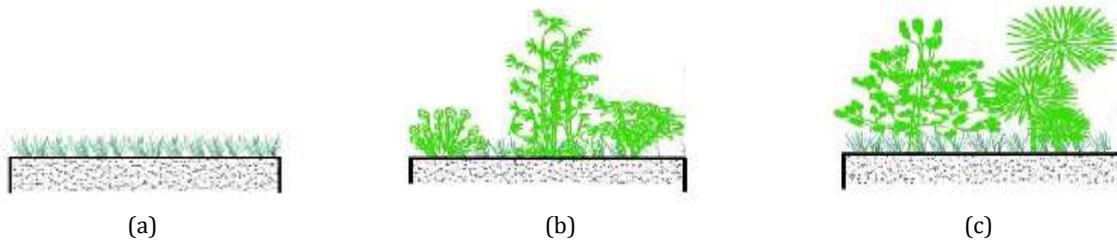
a) Superficially planted green roof b) Semi-densely planted green roof c) Densely planted green roof section (Seçkin and Seçkin, 2016).
